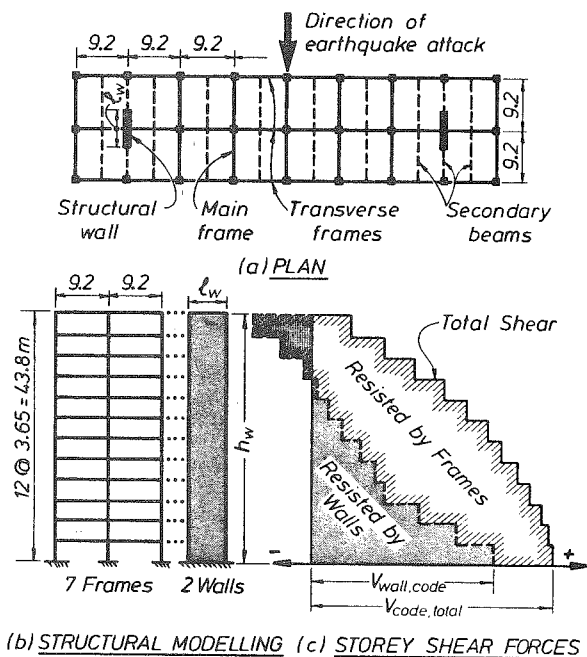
Modelling of and Lateral Load Sharing in a Typical Wall-Frame System.
